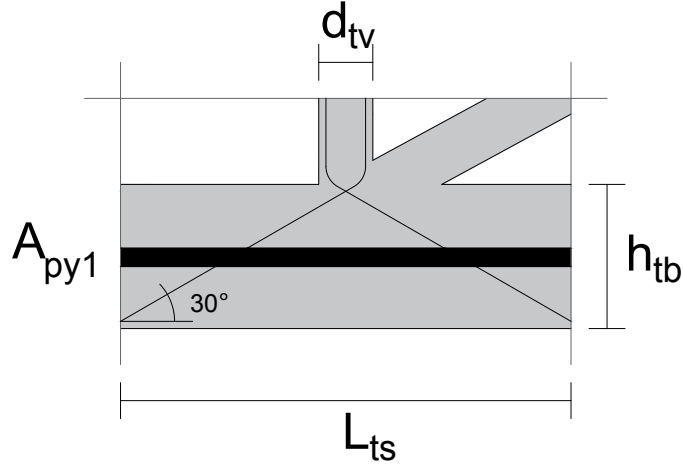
Layout of the suspension reinforcement in the lower truss beam and vertical (not to scale)
